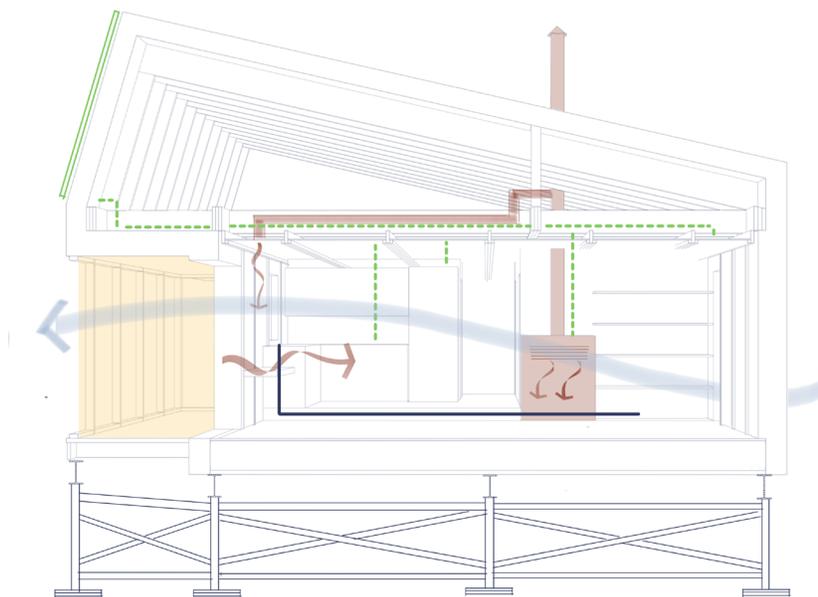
(top-right) Grow Home floor plan representing proposed systems: structure, water, power and heating.
